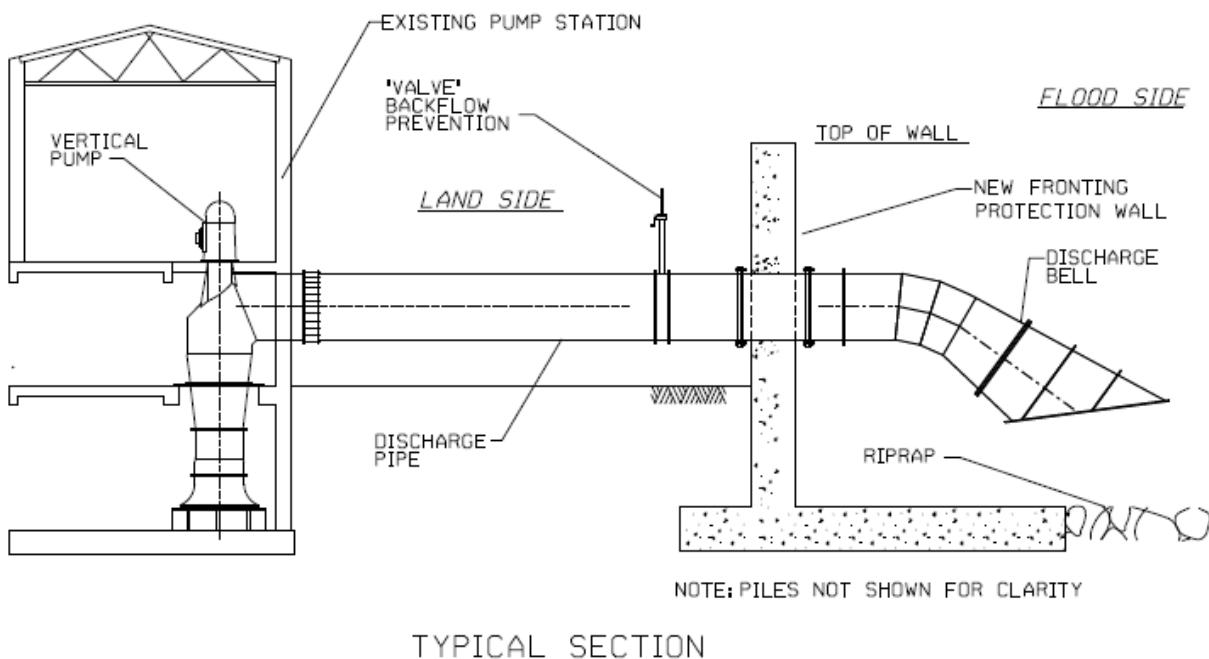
Typical Section of Fronting Protection Wall @ Pump
